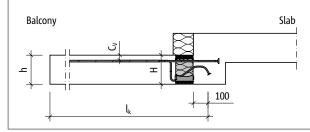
Schöck Isokorb® XT type K-U: Static system
